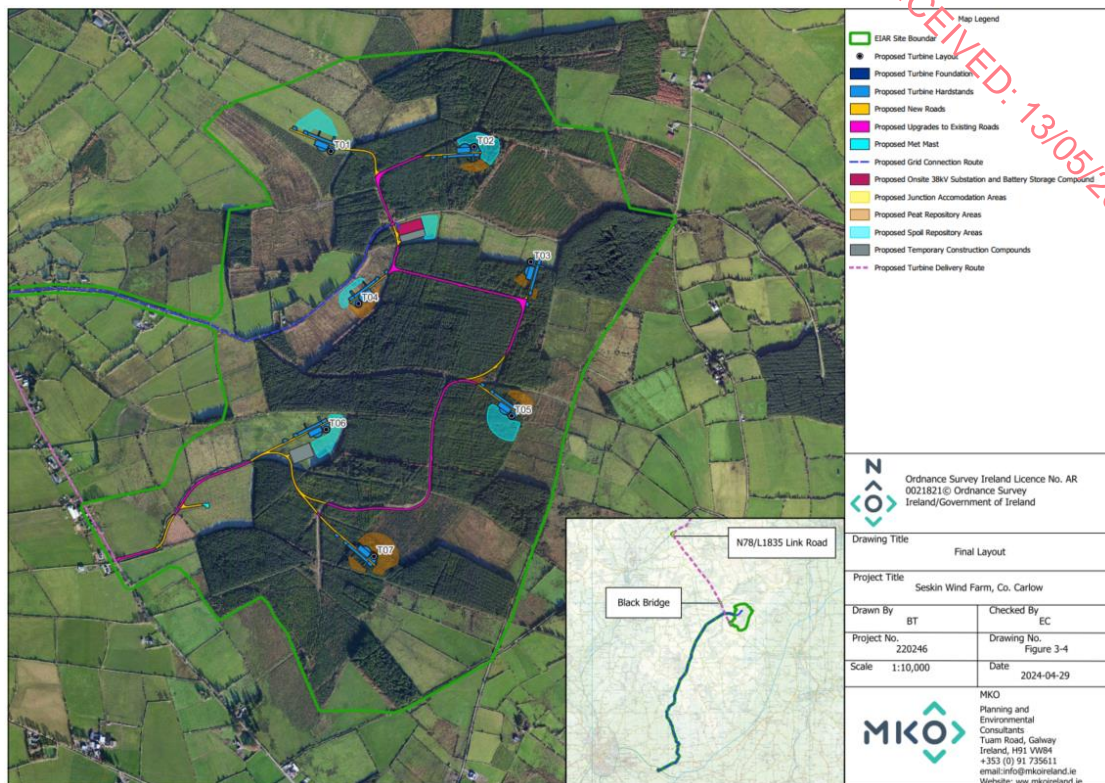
Proposed Layout Iteration No. 4 – Final Proposed Wind Farm Layout
